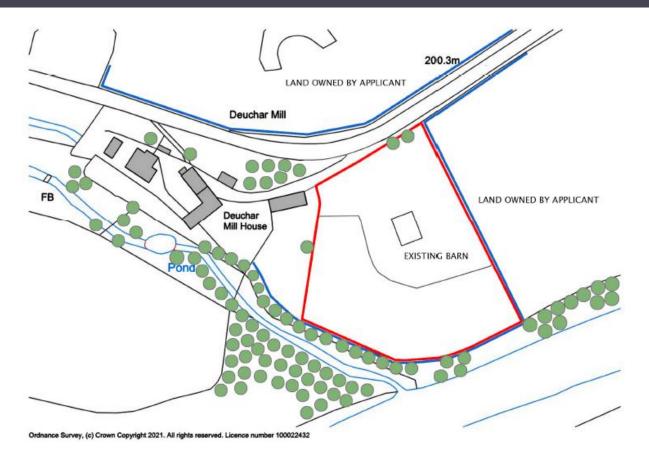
Extract from 10059-0-01 Location Plan (Source: Camerons Strachan Yuill Architects).
